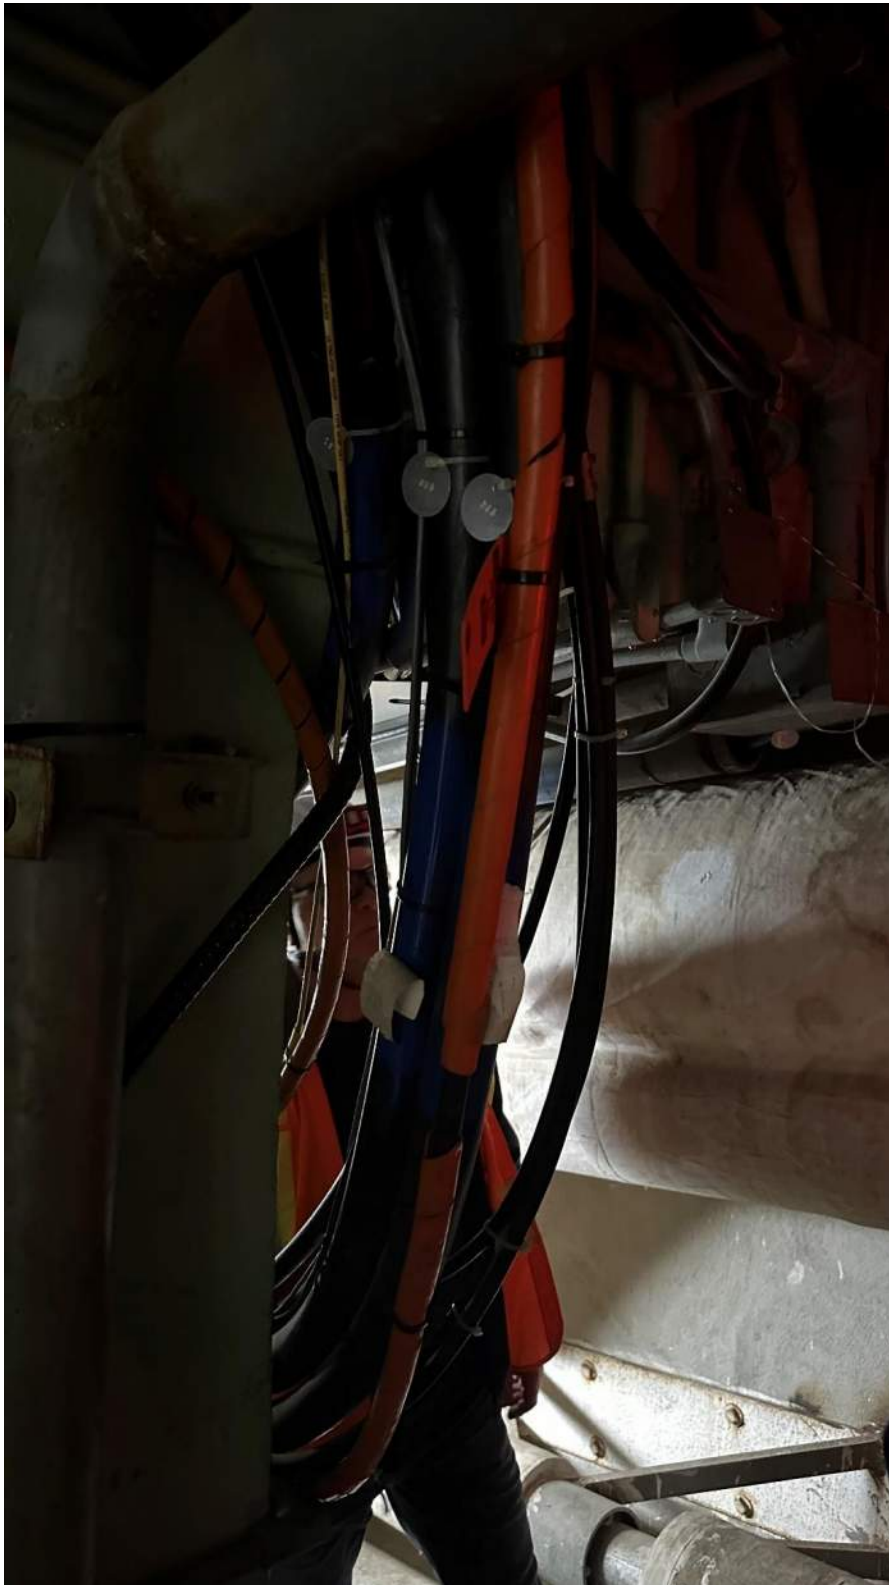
Heating & Cooling Plant - Congested Cabling (Tunnel)
